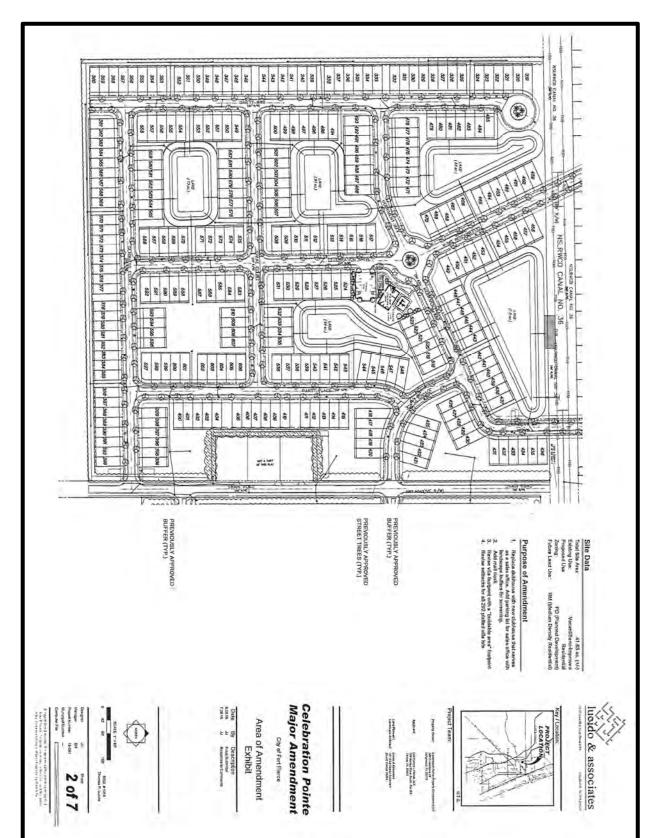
EXHIBIT A Sheet A2 Major Modification to Planned Development Lot 319 Through Lot 610
